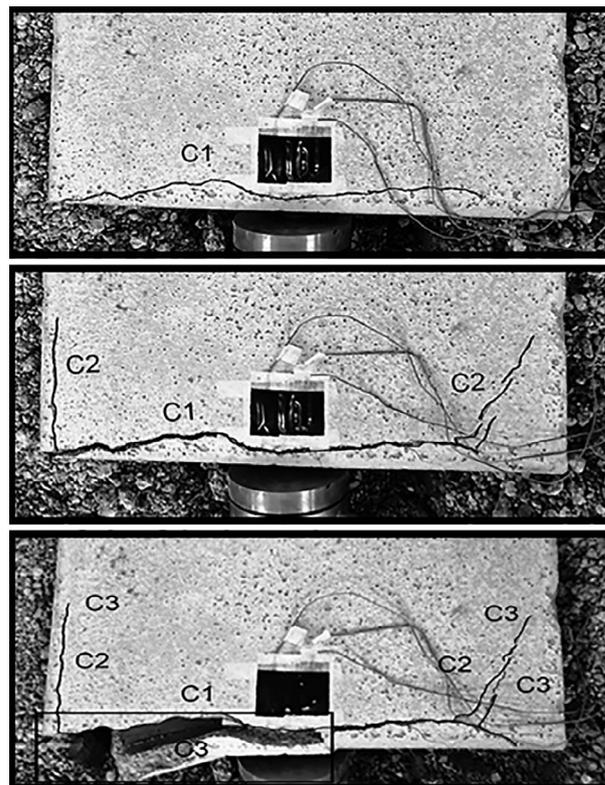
Crack propagation within concrete floodway Specimen 2.
